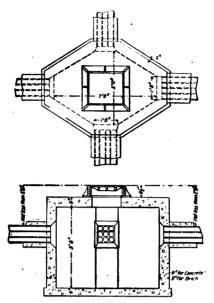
Vault Size 6 to be Used on Runs of 9 to 12 Ducts of Conduit when Intersected.
